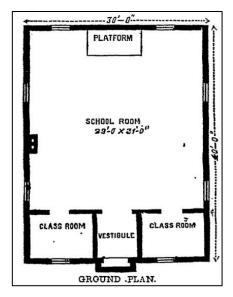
Prospective one-room schoolhouse floorplan (*The Canada Farmer*, Vol. 3, no. 12, p.189)
